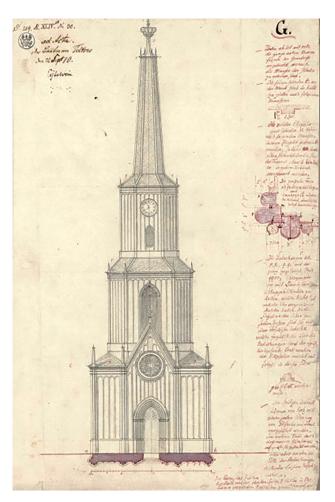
Design of the façade of St. Andrew's Church in Teltow according to Schinkel (source: Staatliche Museen zu Berlin, Kupferstichkabinett / Wolfram Büttner, https://recherche.smb.museum/ detail/1506073/teltow--st--andreaskirche--turmentwurf-?language=de&question=teltow&limit=15&sort=relevance &controls=none&objIdx=5)
